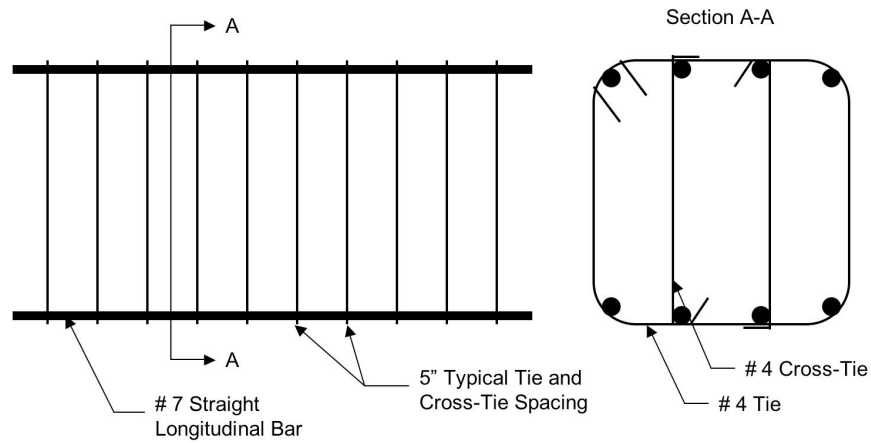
Bond Specimen Elevation and Cross-Section
